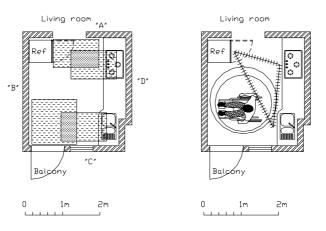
Floor layout analysis of Kitchen 9596-02.
